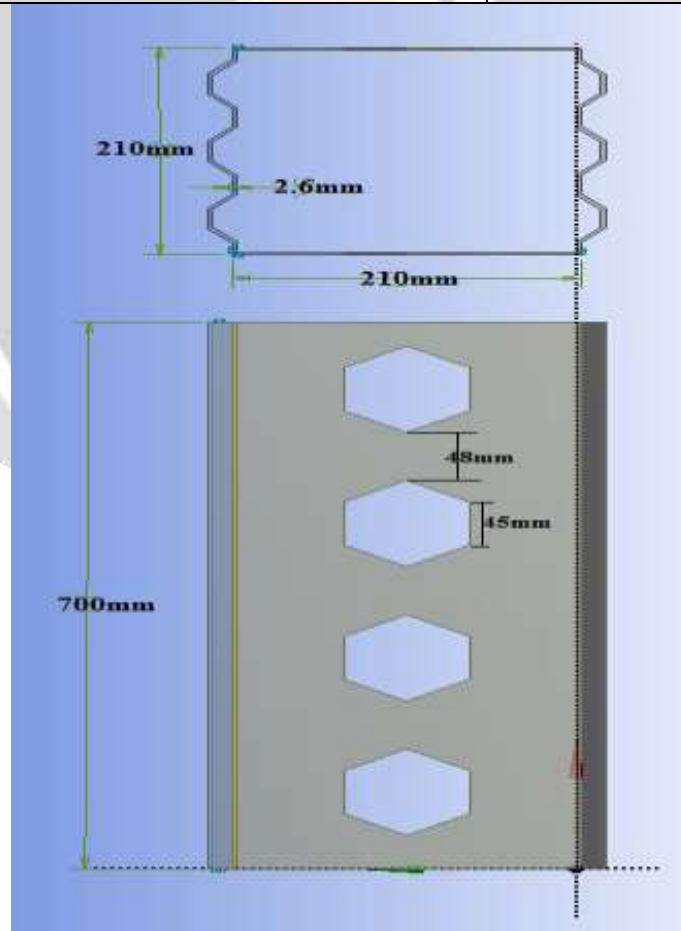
Two sides corrugated 2 side plane column with hexagonal openings(TCH) dimensions
